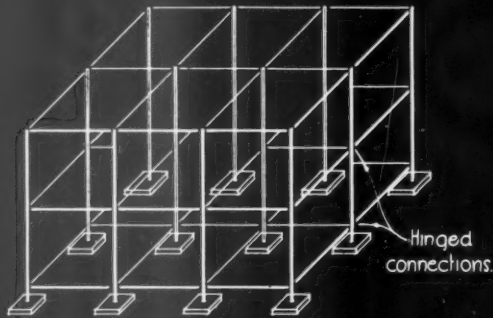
Steel frame with beams hinged between columns (unstable).
